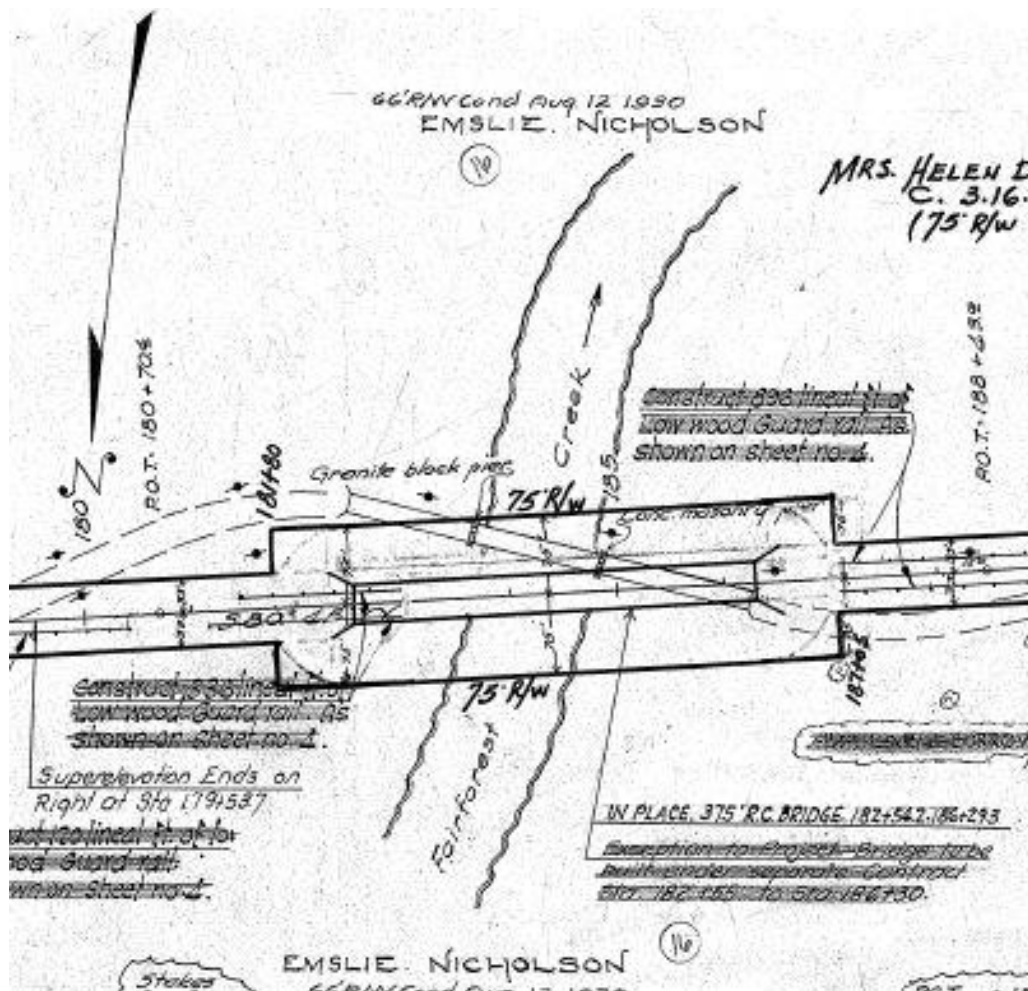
Portion of the 1937 construction plans (north is pointing down).
